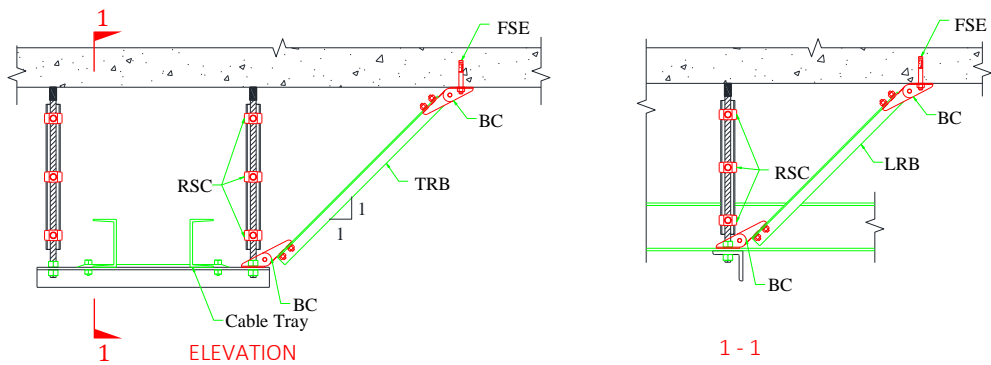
Seismic Rigid Bracing for Trapeze supported electric cable trays duct
